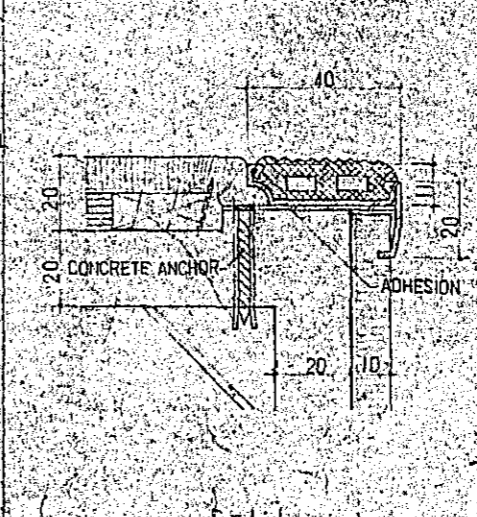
DETAIL OF HANDRAIL (ORCHESTRA PIT) COLOURED ALUMINUM
